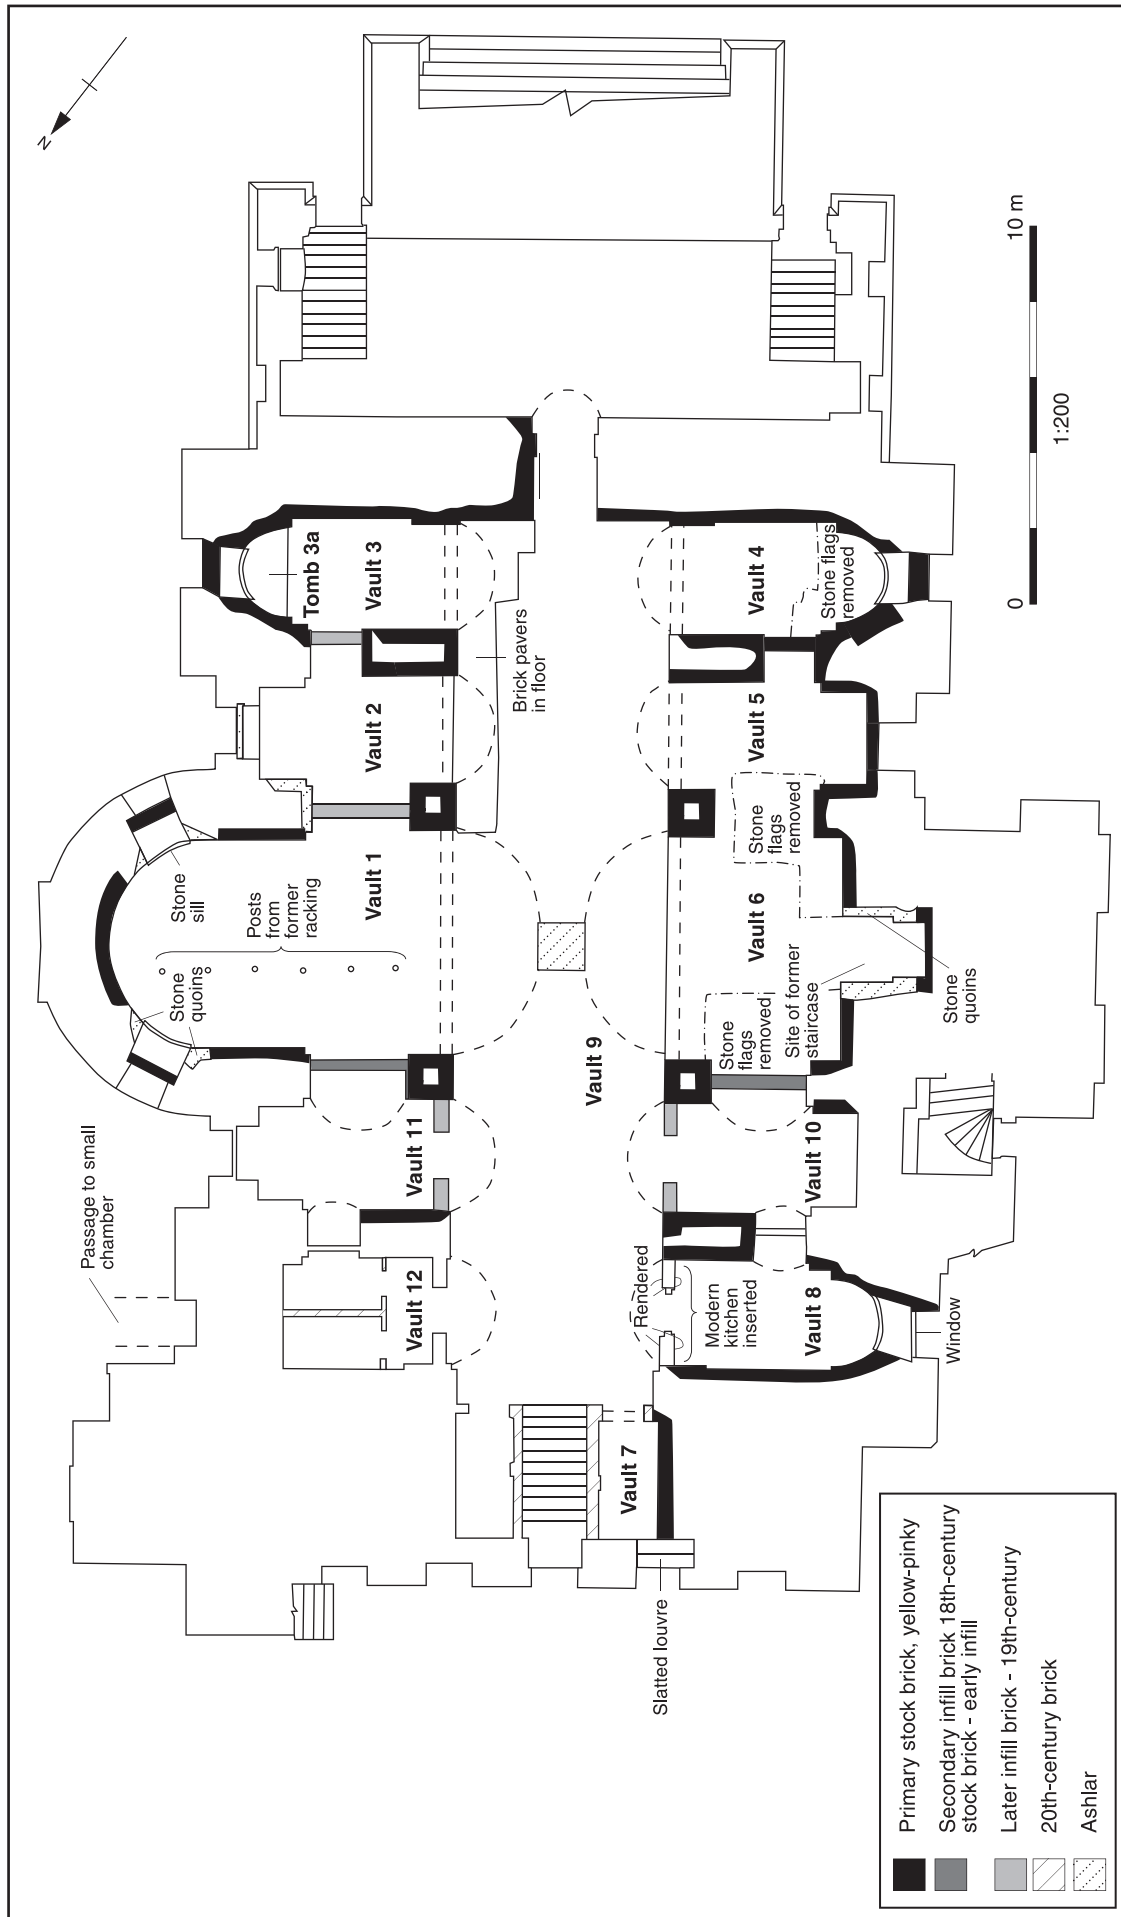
Plan of crypt showing brickwork and ashlar work
